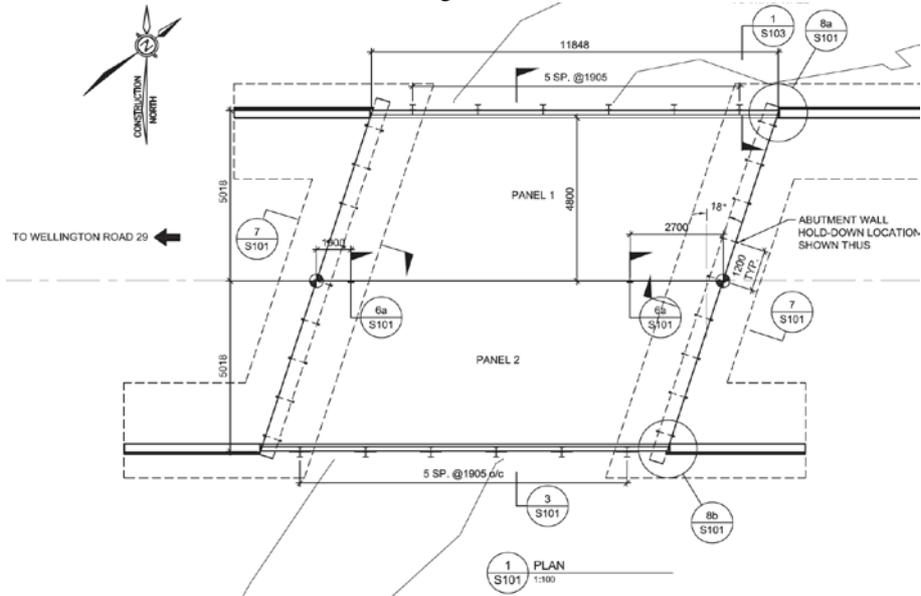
shows a precast concrete design with 10 rigid span structures at 450mm deep plus the added work scope item of dowels, rebar with a 150mm cast in place concrete deck.
